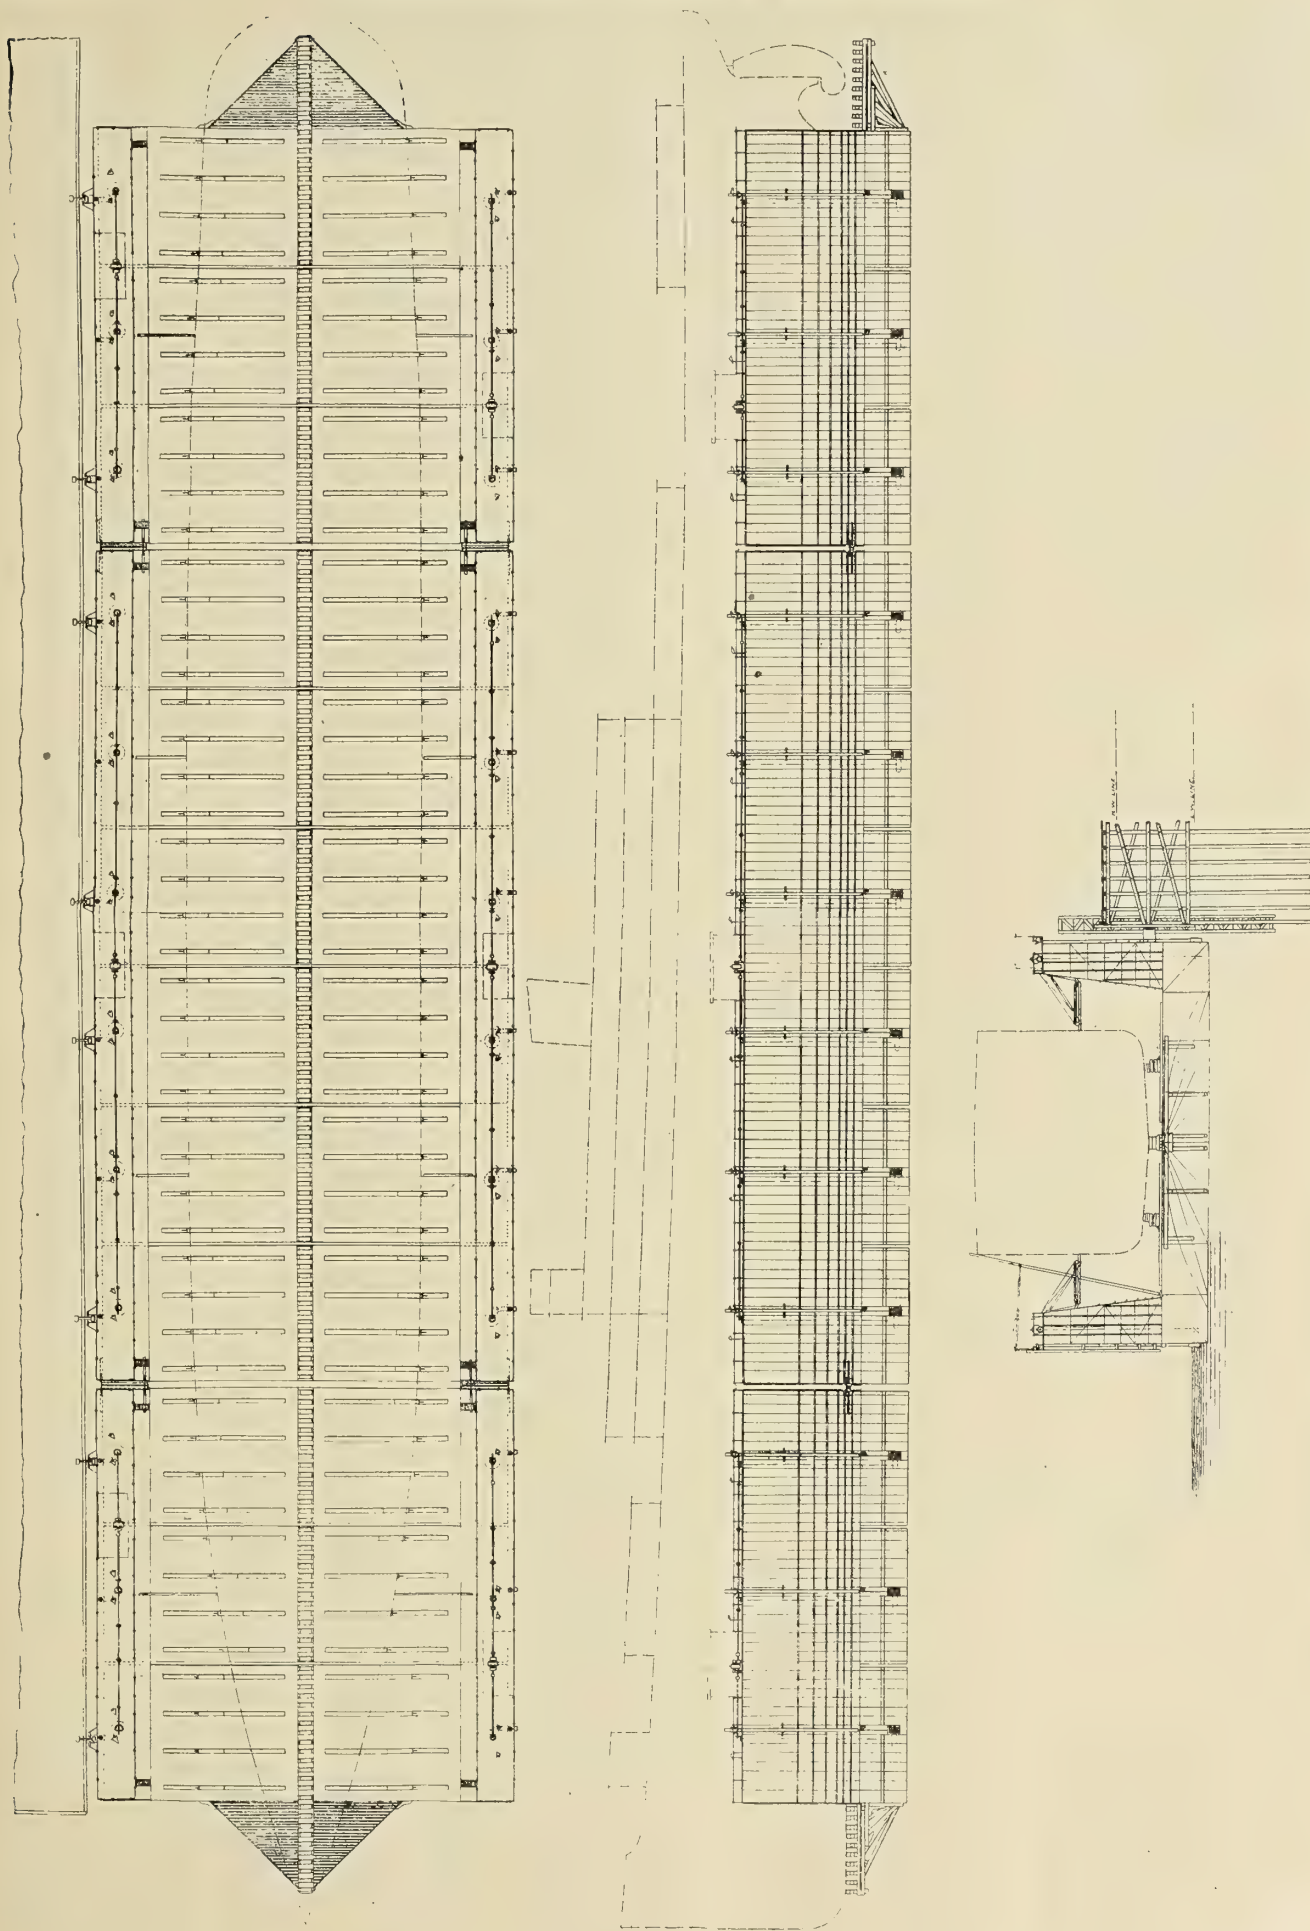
PLAN, ELEVATION AND CROSS SECTION OF 20,000-TON PONTOON FLOATING DRY-DOCK FOR THE MARINE TERMINAL OF THE GRAND TRUNK PACIFIC RAILWAY. PRINCE RUPERT, BRITISH COLUMBIA
